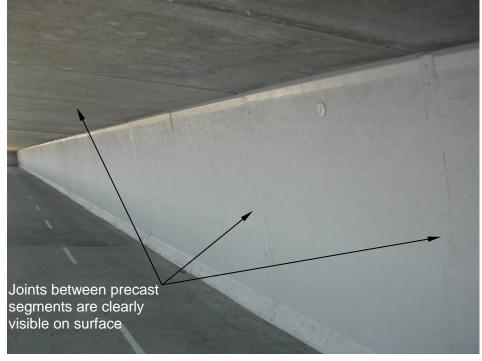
I - PRECAST SEGMENTAL PRESTRESSED CONCRETE
